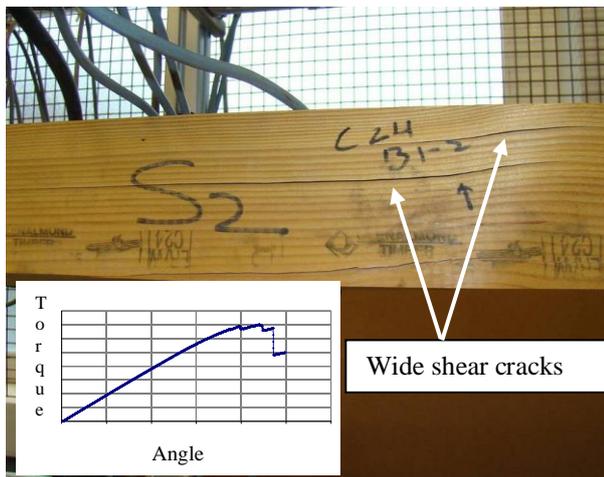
A typical wide shear cracks occurred in C24 timber joists under torsion loading
